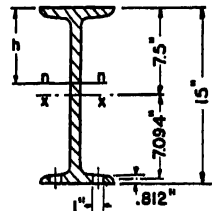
I Beam Section with Holes in Lower Flanges.
